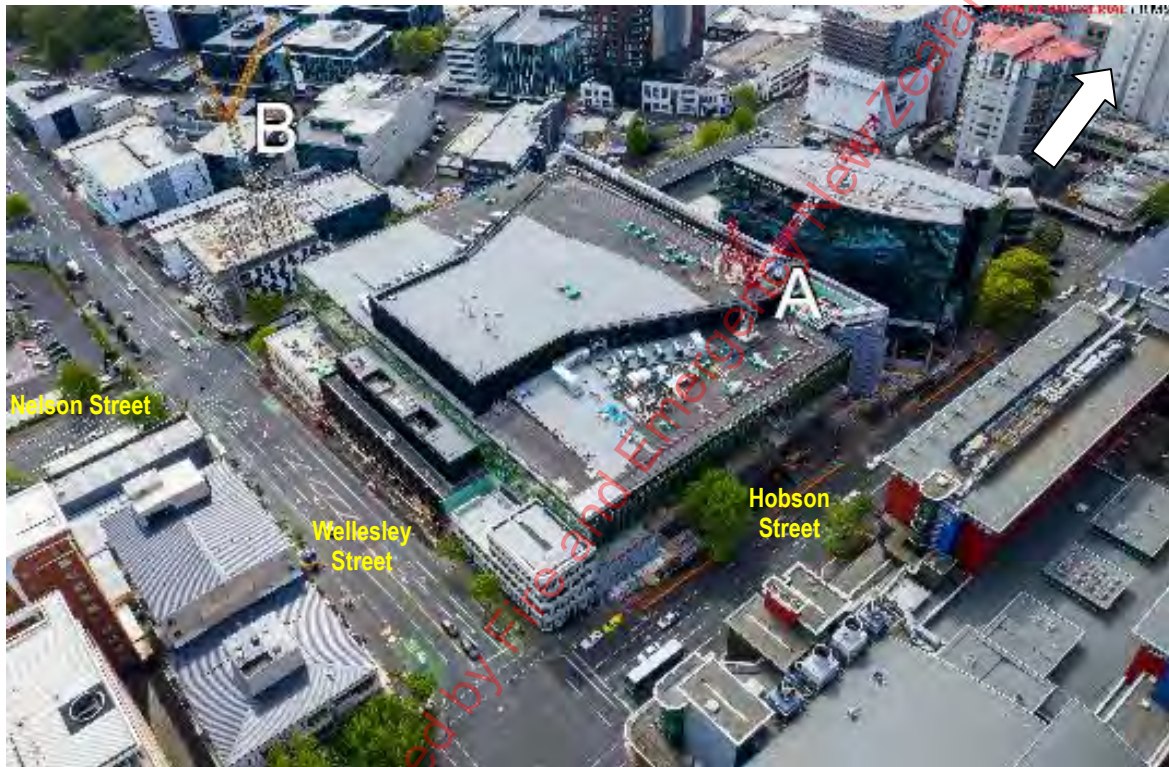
Tower Crane 1 (TC1) is marked "A", The Tower crane located in the Sudima Hotel Construction site is marked "B". North indicated by white arrow. Photo supplied by Fletcher Construction.
